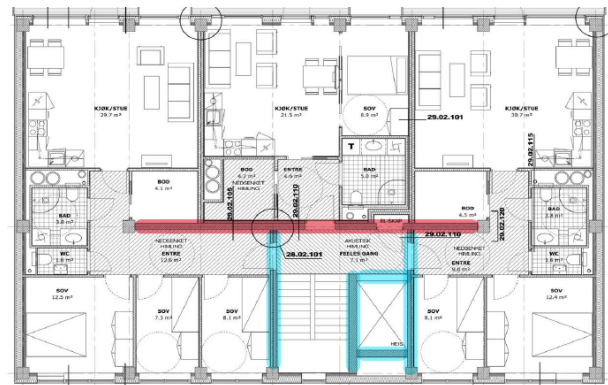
Floor plan of the wooden building with structural stabilizing internal walls marked in blue and red. Edited illustration from Løvseth (2019)
